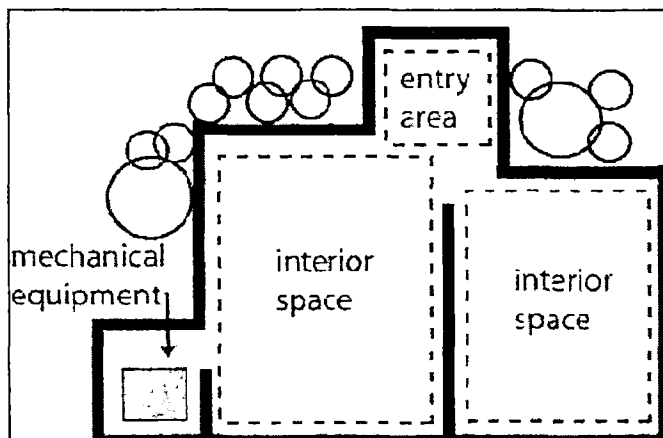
I: Mechanical and electrical equipment incorporated into site layout
